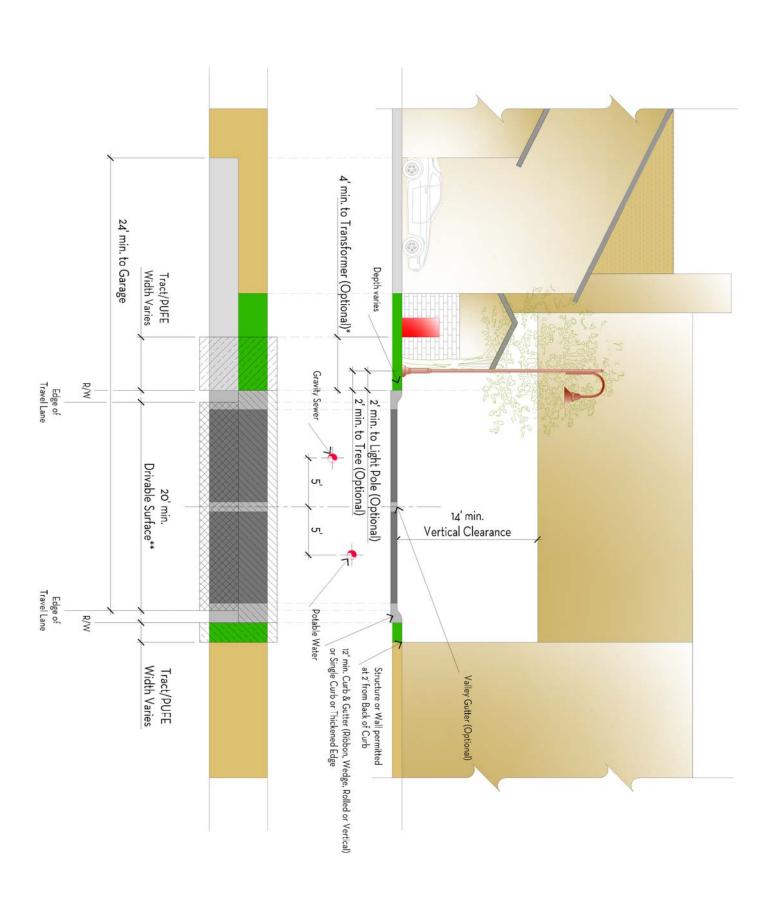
One-Way Neighborhood Street - Detailed Cross Section
